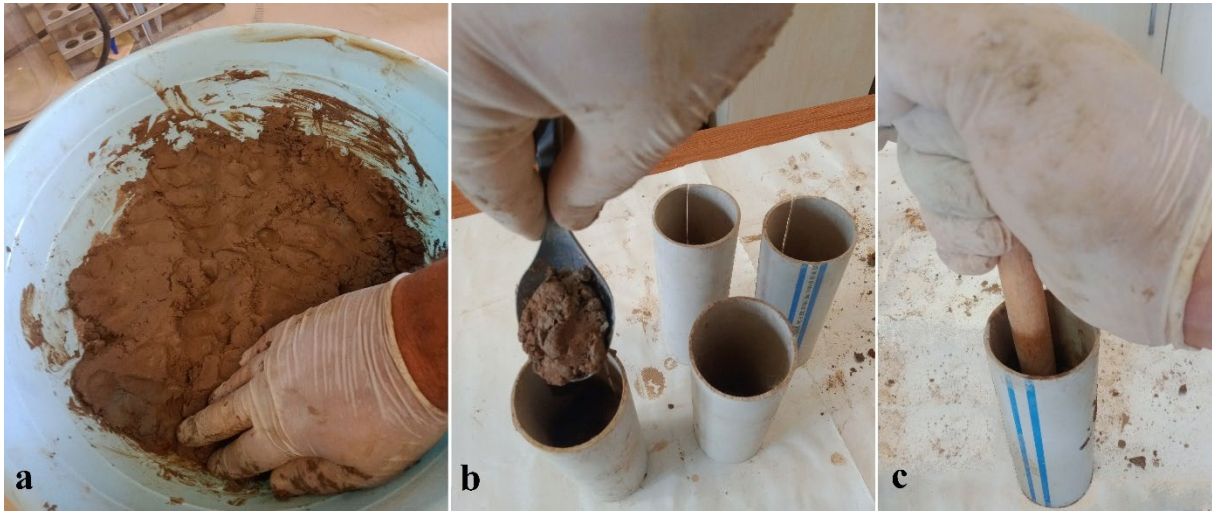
a) specimen mixing, b and c) UCS test specimen molding
